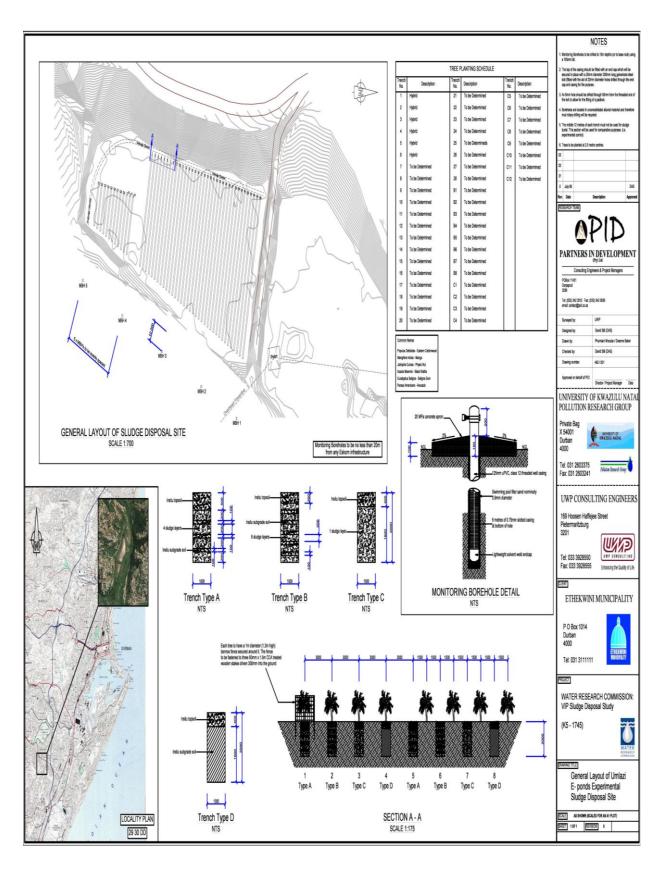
General layout and details of the Umlazi VIP latrine sludge entrenchment site.
